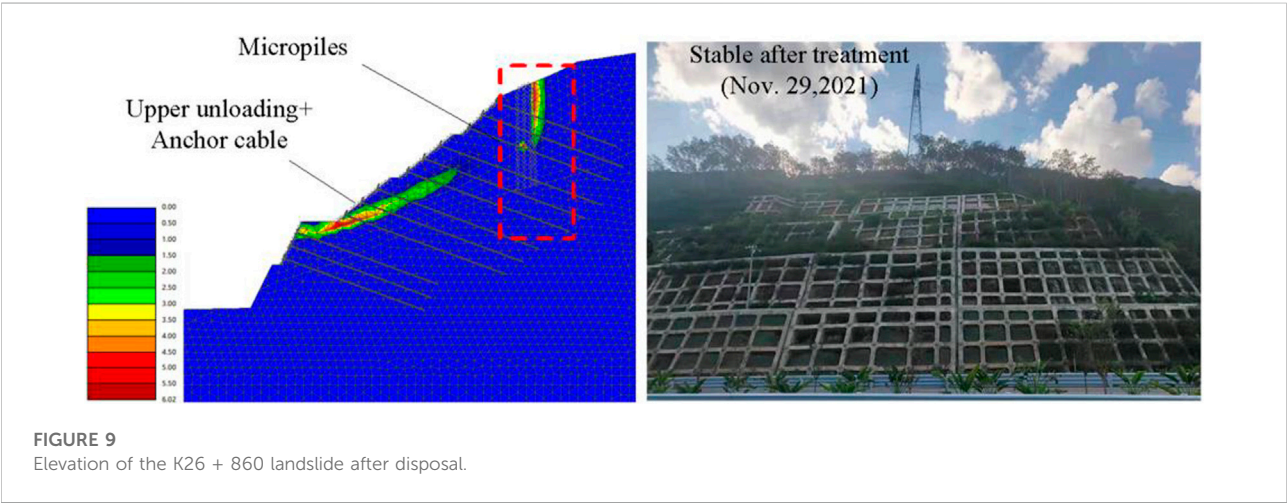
Elevation of the K26 + 860 landslide after disposal.
